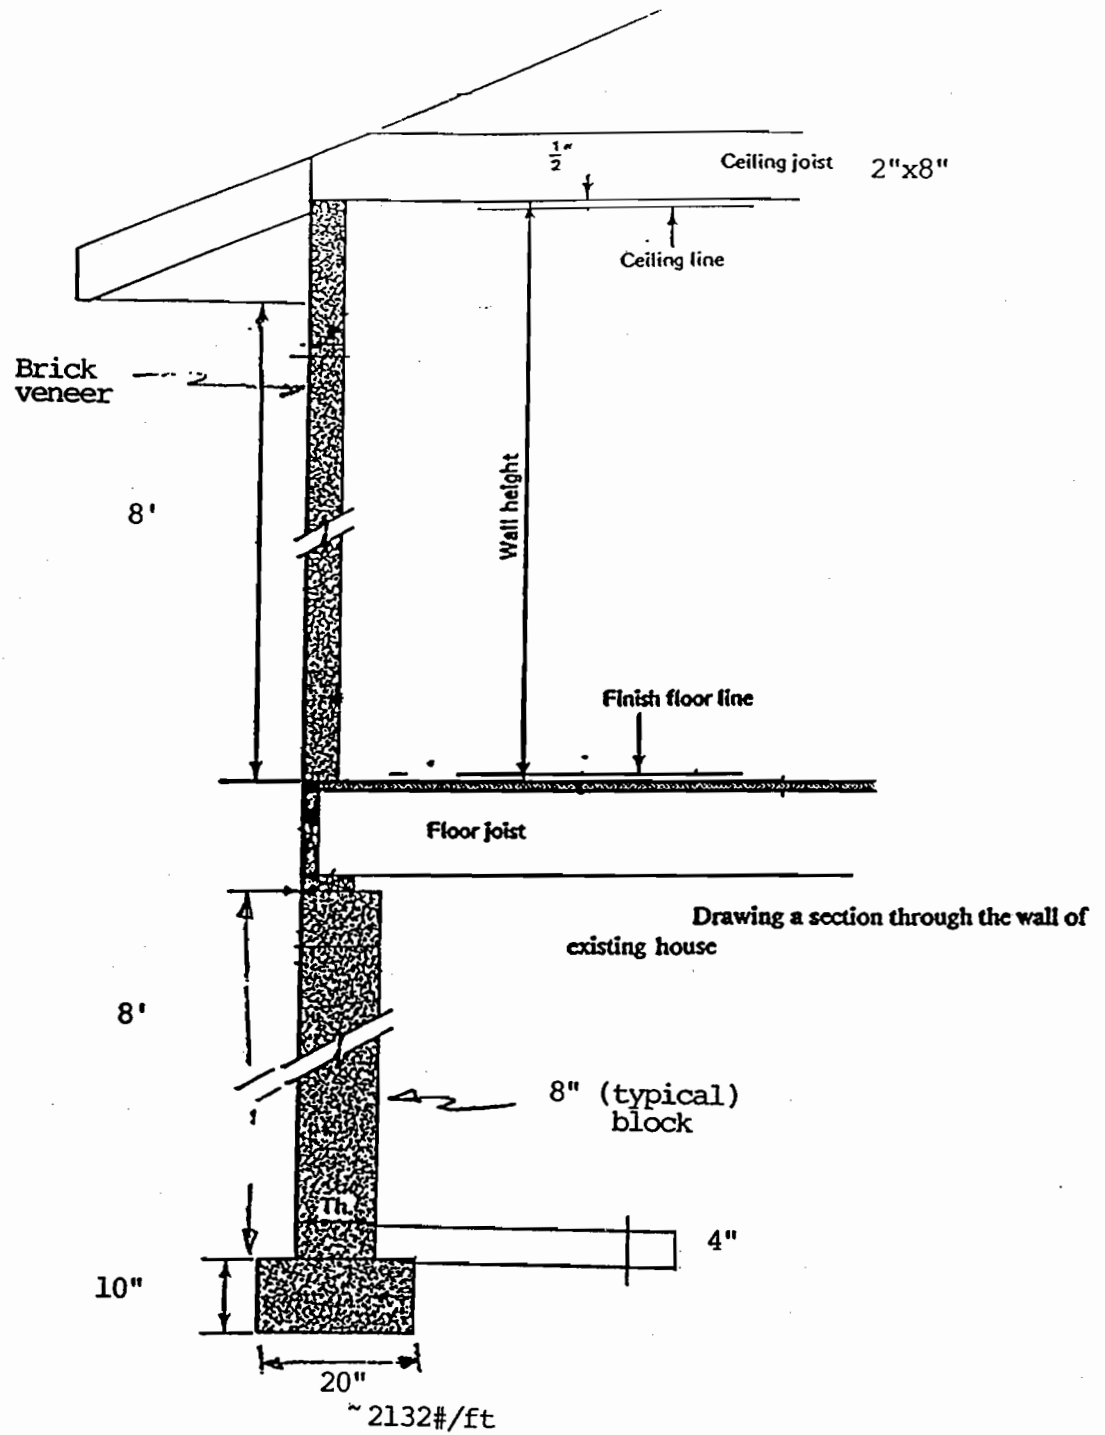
Idealized cross section of the one-story house for estimating footings loads
